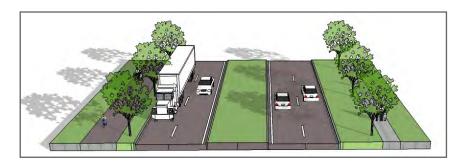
Sidewalk Setbacks and Tree Buffers
